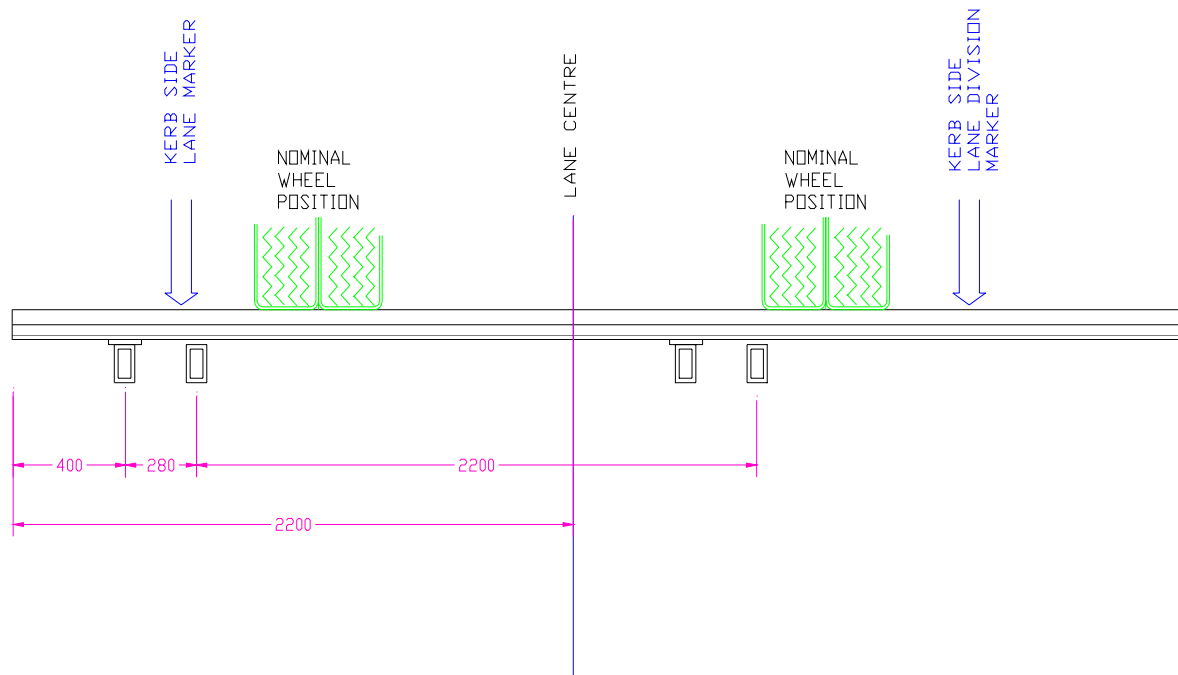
Elevation of MBEJ and Nominal Test Truck Position (Anzac)
